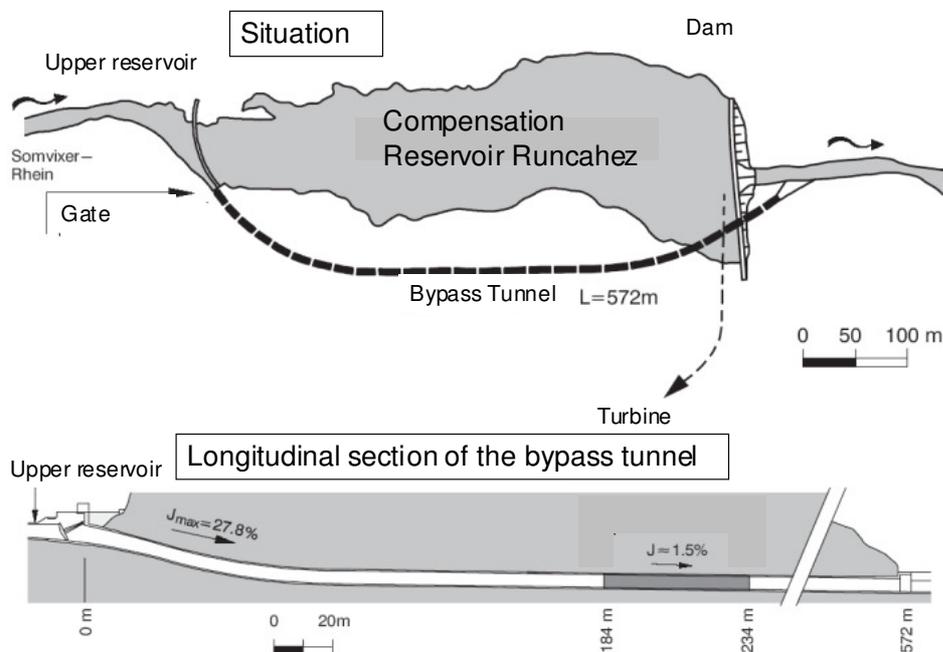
Situation of the reservoir with bypass tunnel and longitudinal section of the bypass tunnel (De Cesare et al 2008a)
